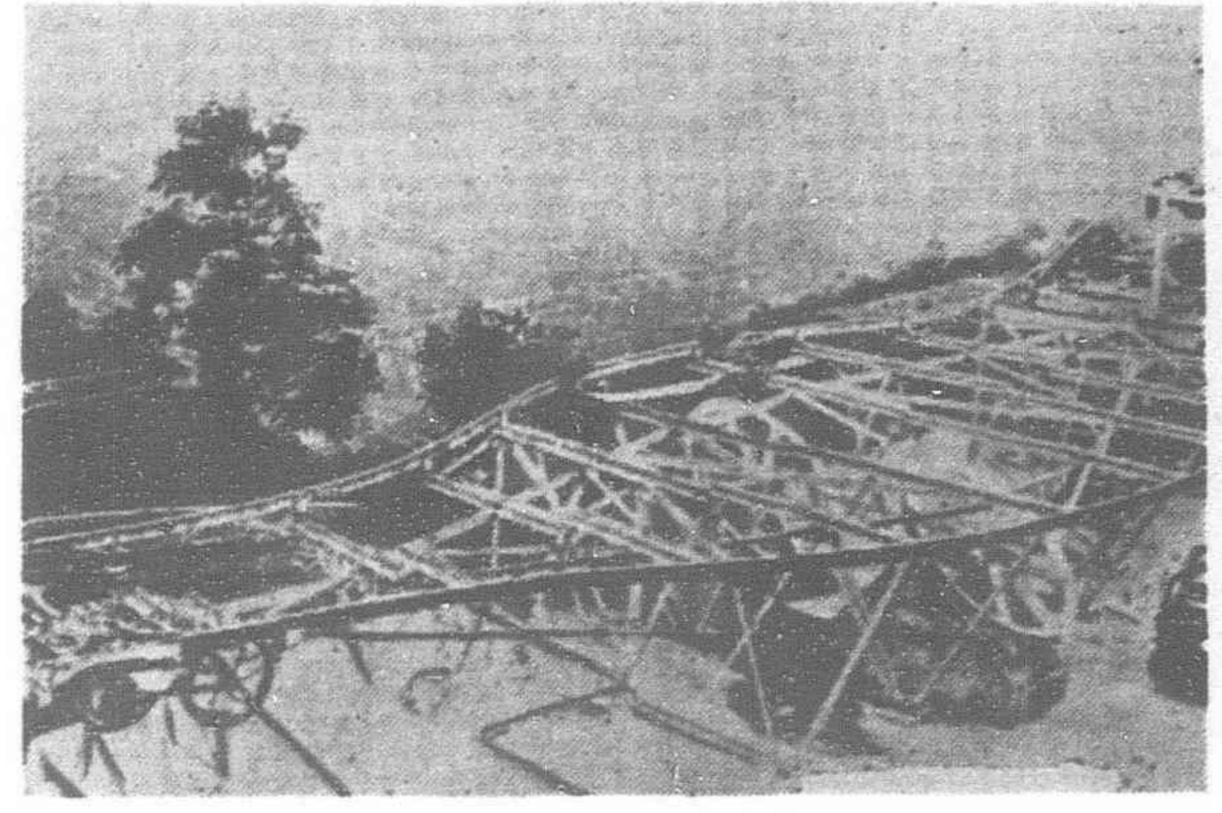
A monocable angle station at ground level showing inclined rope deflection sheaves (Ropeways Ltd.)
